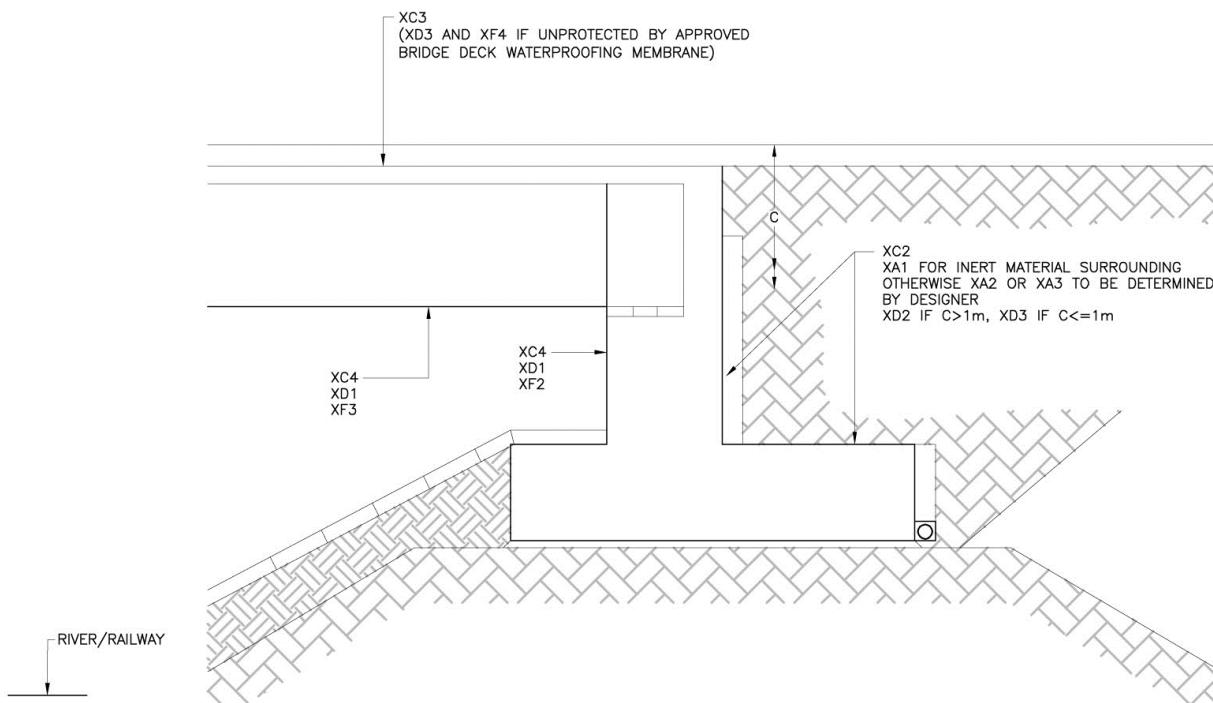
Underbridge Structure (Road Over River / Railway) – End Support
